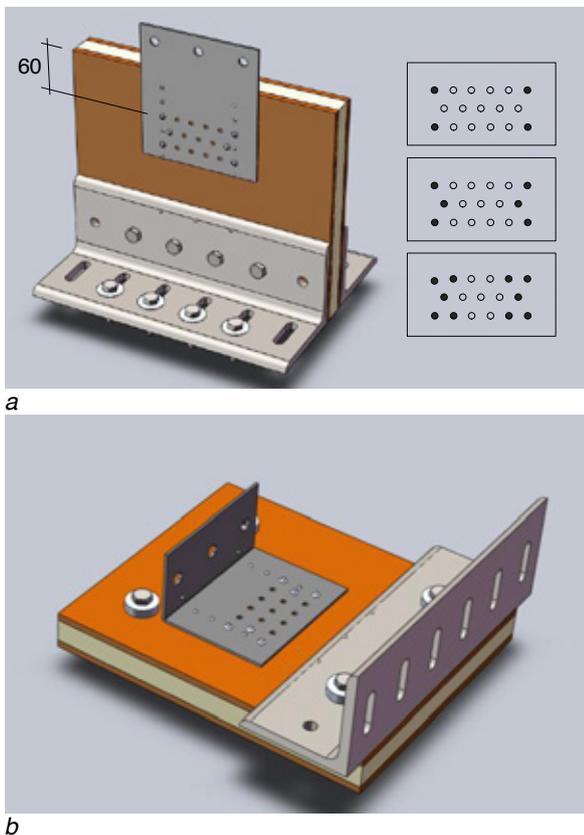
The test specimens including screw configurations and foundation arrangement for simulation of: (a) the floor load and (b) the wind suction load. Edge distance is 60 mm between top of plyboard specimen and the first screw row. Plyboard specimen 360x300x42 mm ($w \times h \times t$), hanger steel plate 160x3 ($w \times t$) of grade S355, anchor screw 5,0x40 mm.
